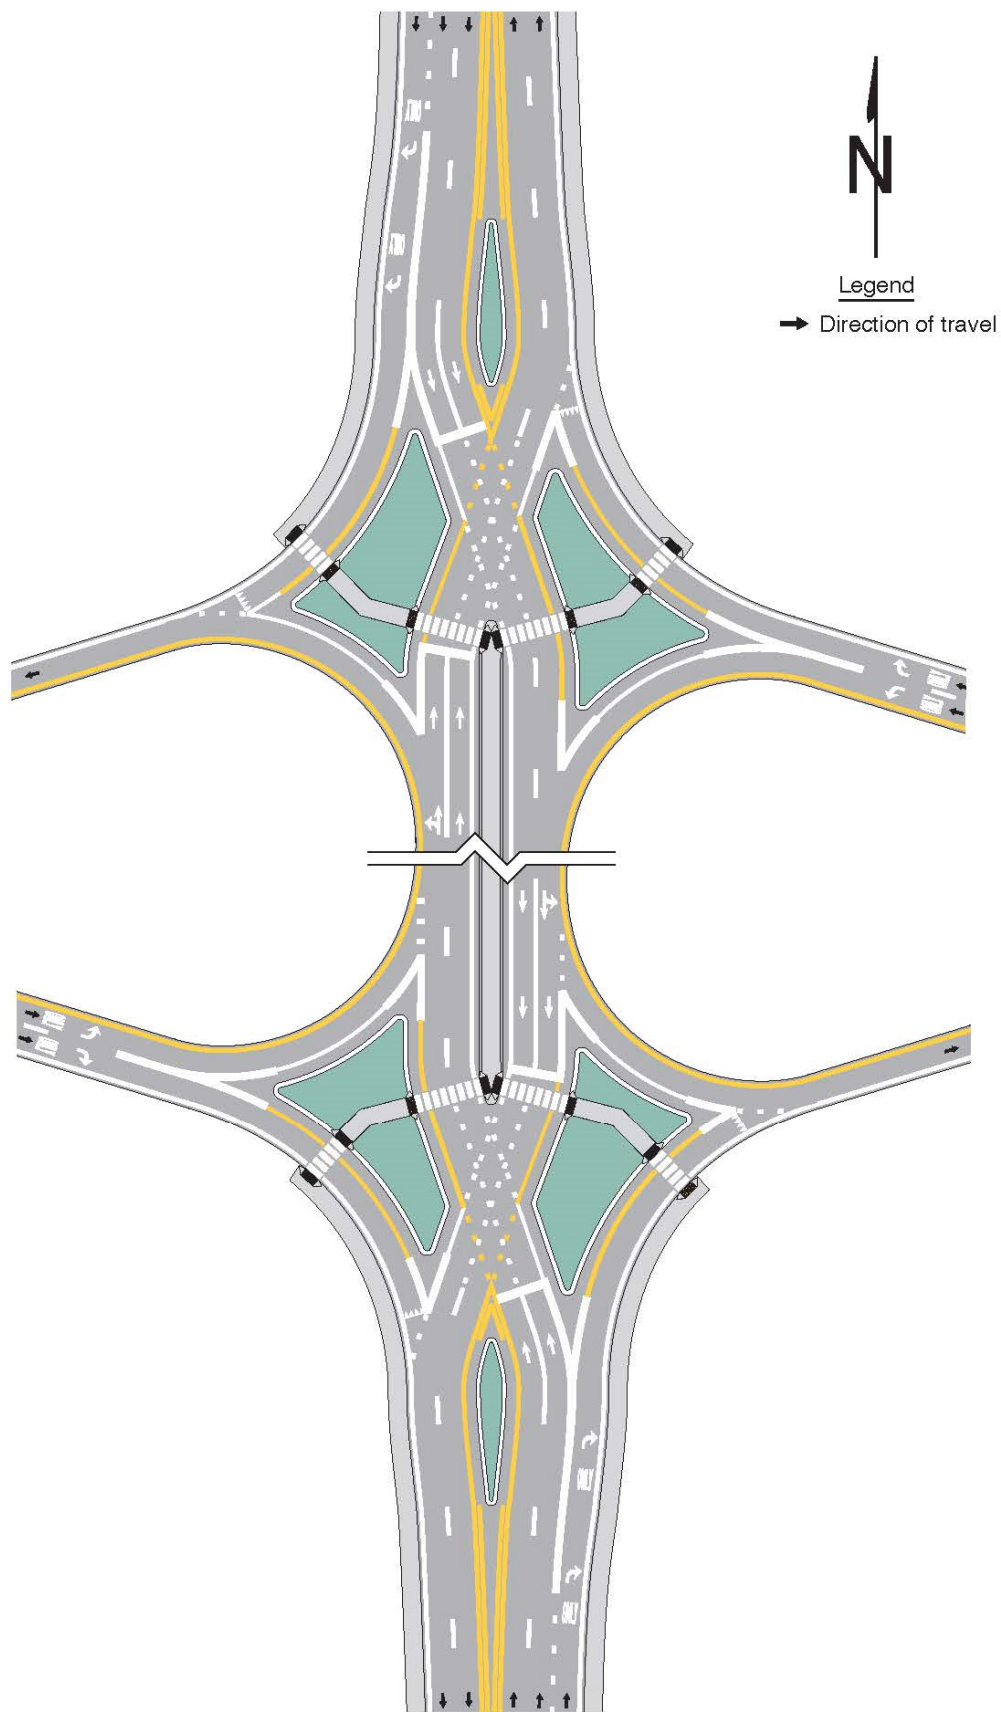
B-29. Example of Pavement Markings for a Diamond Interchange with a Transposed Alignment Crossroad
